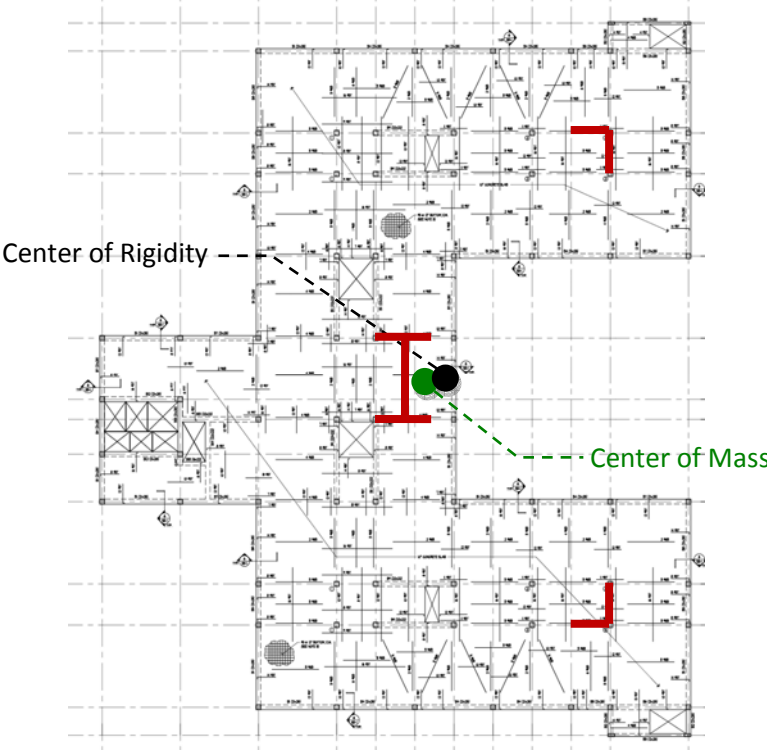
Concrete Shear Wall Design; Center of Mass and Rigidity Level 5
